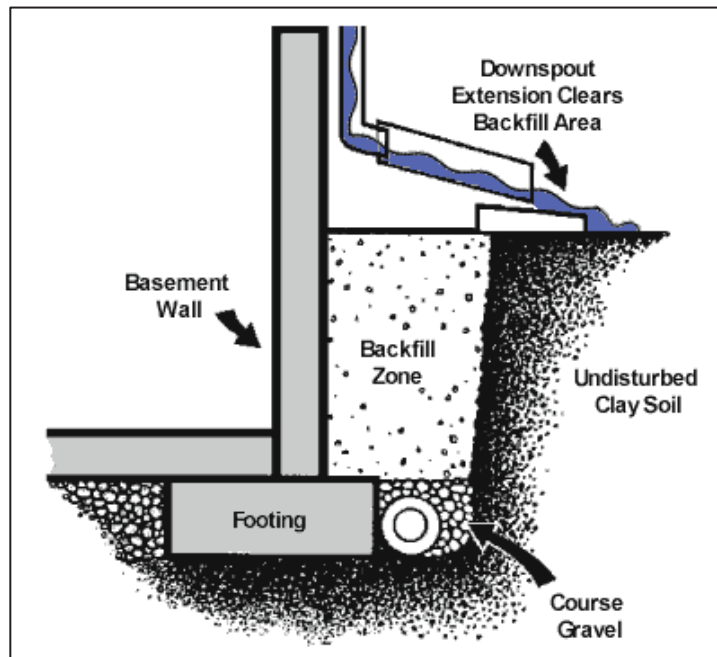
Schema of a typical downspout disconnection. ([www.enermac.com](http://www.enermac.com))
